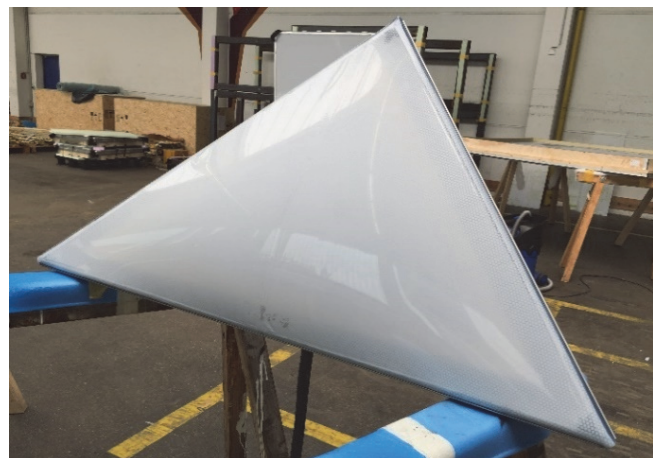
White ETFE-foil element mounted on a timber frame and tested with an internal overpressure, ©Taiyo Europe
